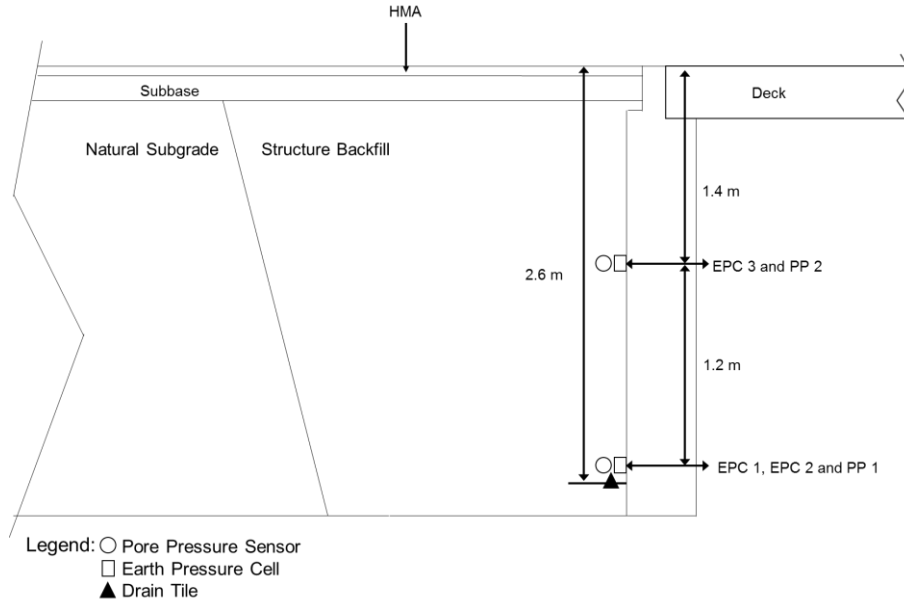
Cross-sectional view of the bridge abutment showing EPC and PP sensor locations at Badger Road Bridge
